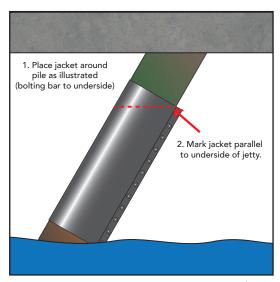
How to locate and mark the HDPE Jacket for cutting.
